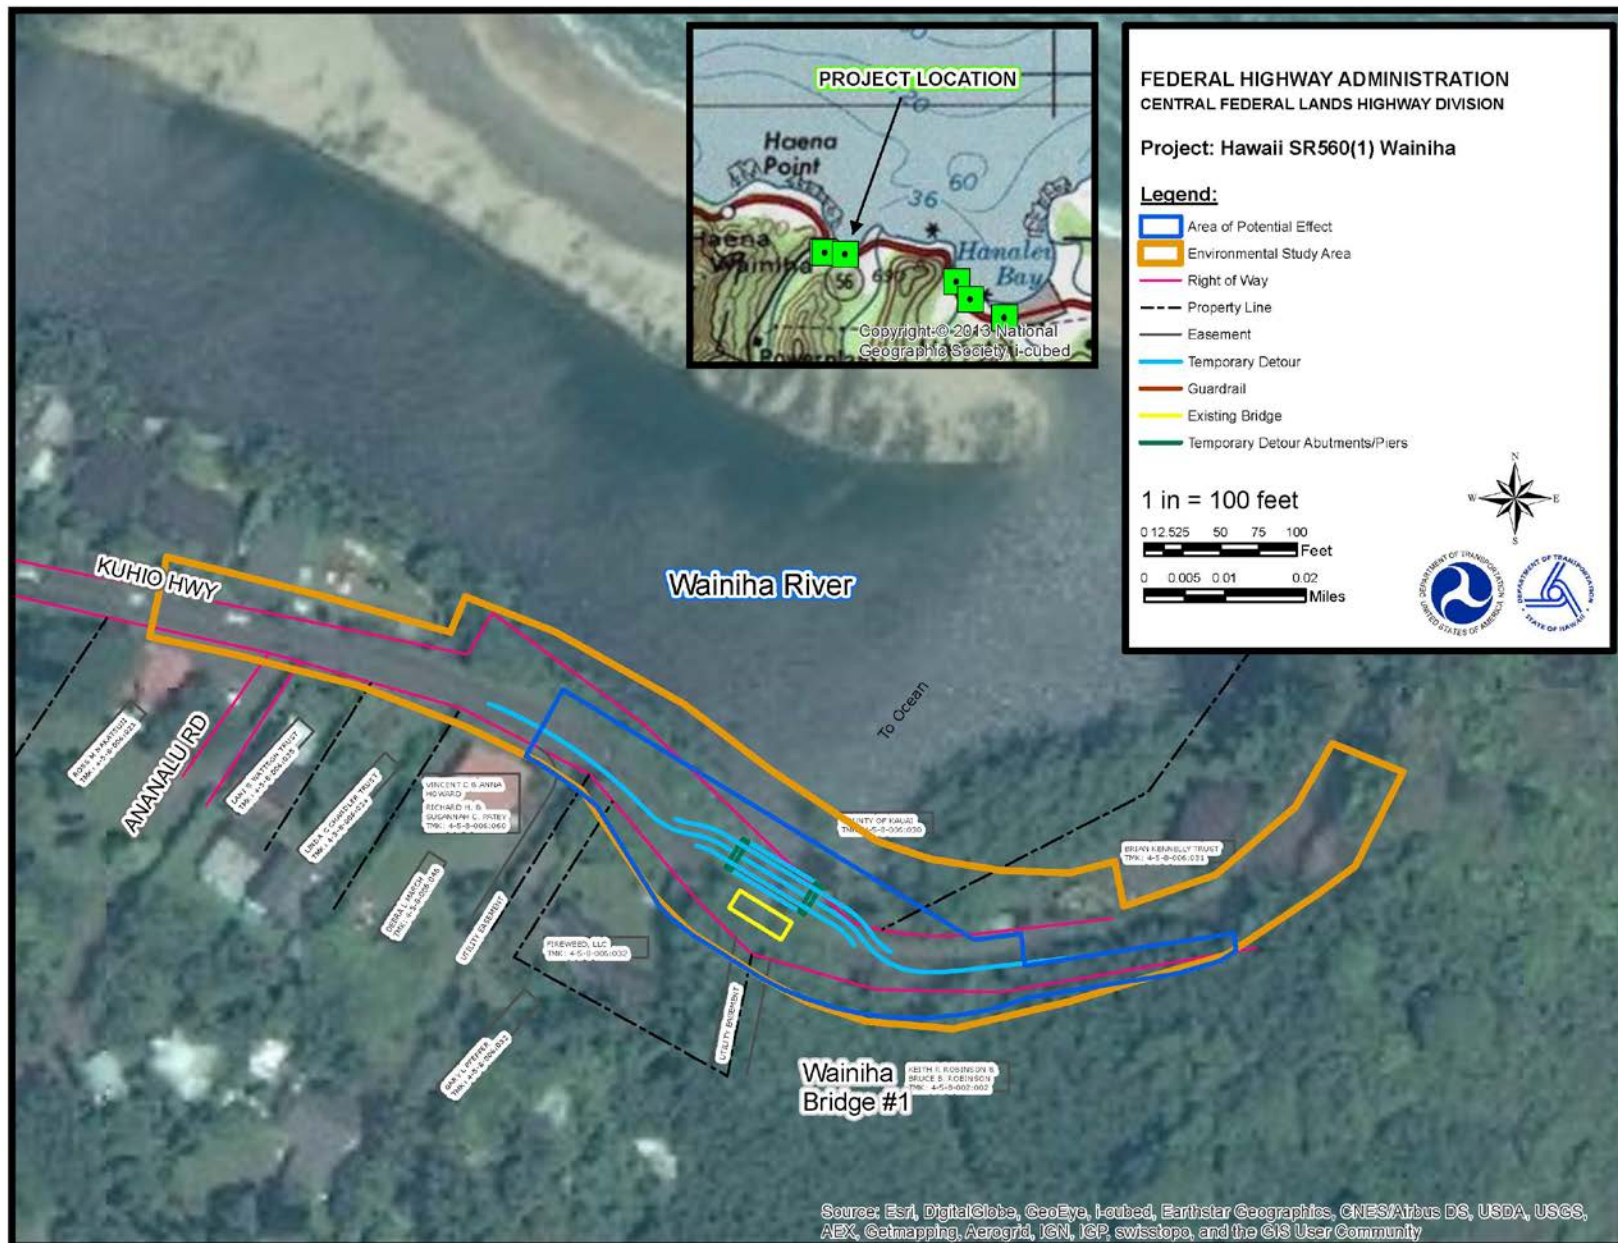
Approximate Location of Proposed Temporary Bypass Alignment at Bridge 1
